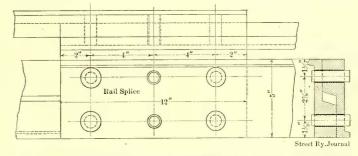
FIG. I.—PLAN, ELEVATION AND SECTION OF JOINT OF RETURN CONDUCTOR, MADE UP OF TWO OLD HORSE RAILWAY RAILS
